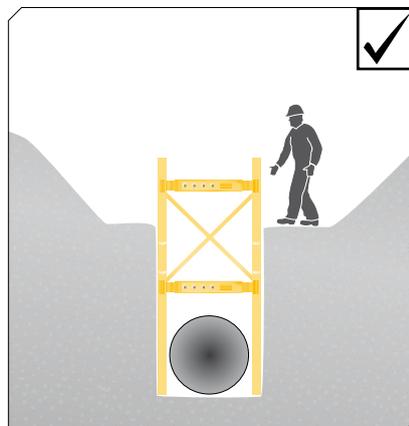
Example of a section of trench shoring extending above the excavation for fall protection.
